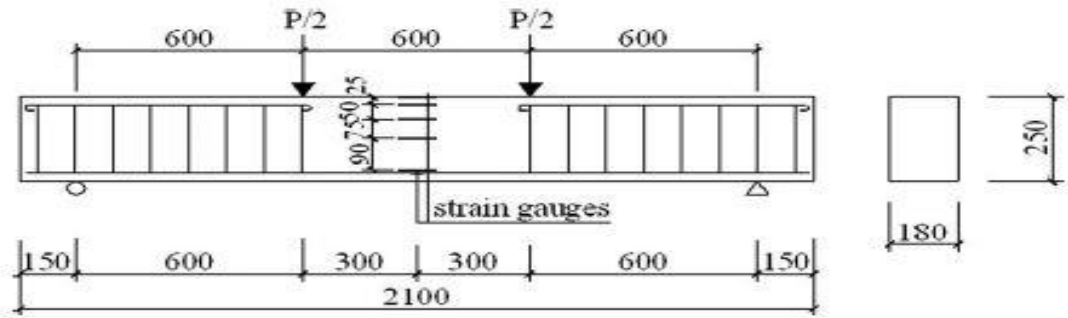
Shows the test setups and details for steel beam (Qu et al., 2009)
